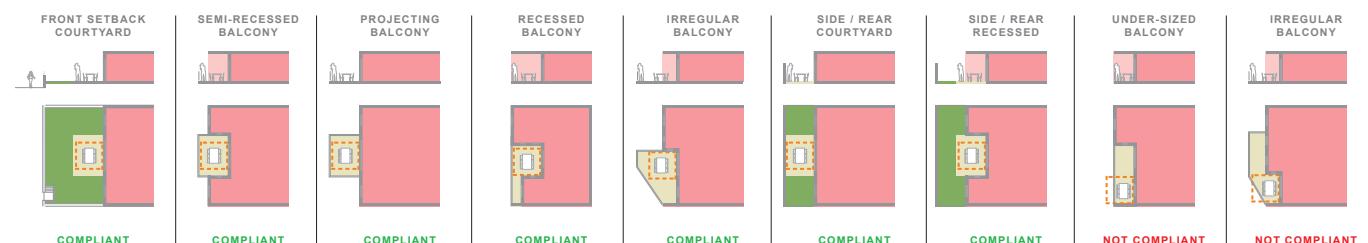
illustrates a variety of ways private open space can be incorporated within a dwellings-multiple development.
